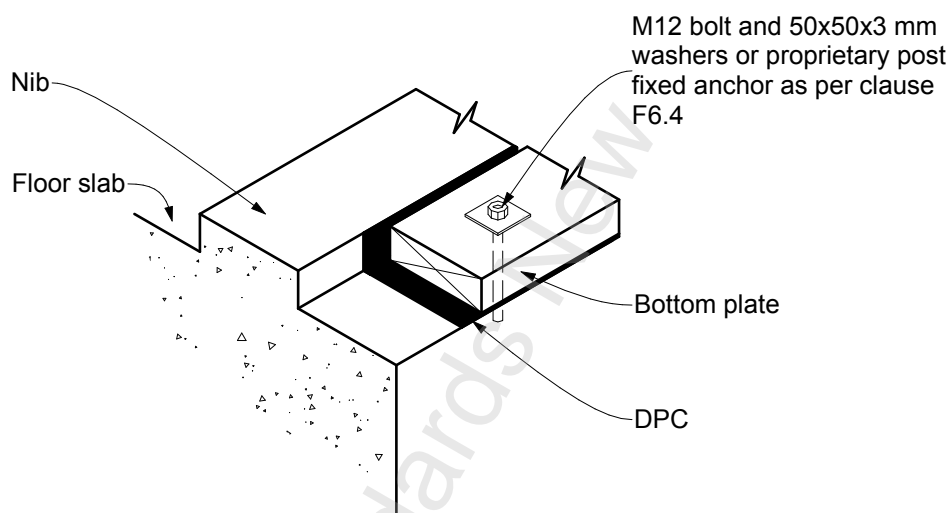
Fixing of bottom plates to slabs and cast-in anchors
